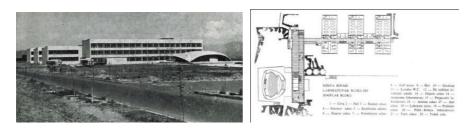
Erzurum Atatürk University Campus, Chemistry Building, 1955-63, view from the east, ground floor plan.
